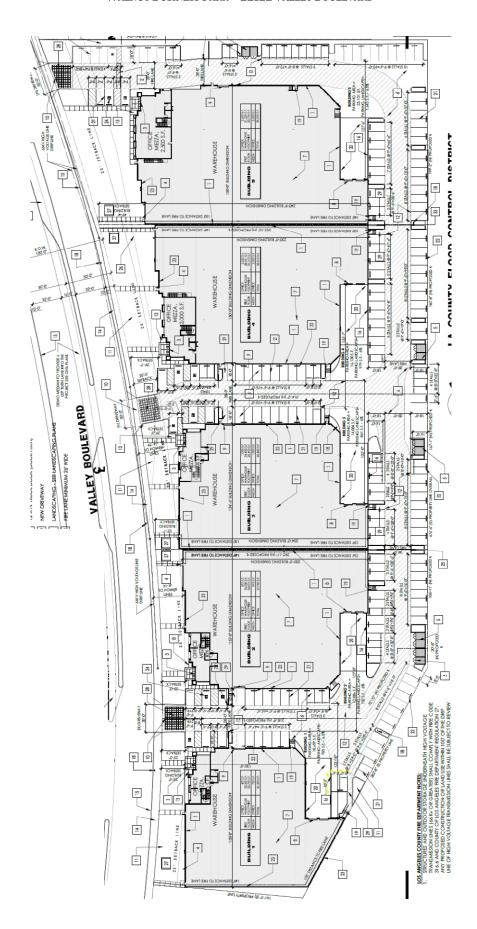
PROPOSED SITE PLAN Source: O.C. Design & Engineering
